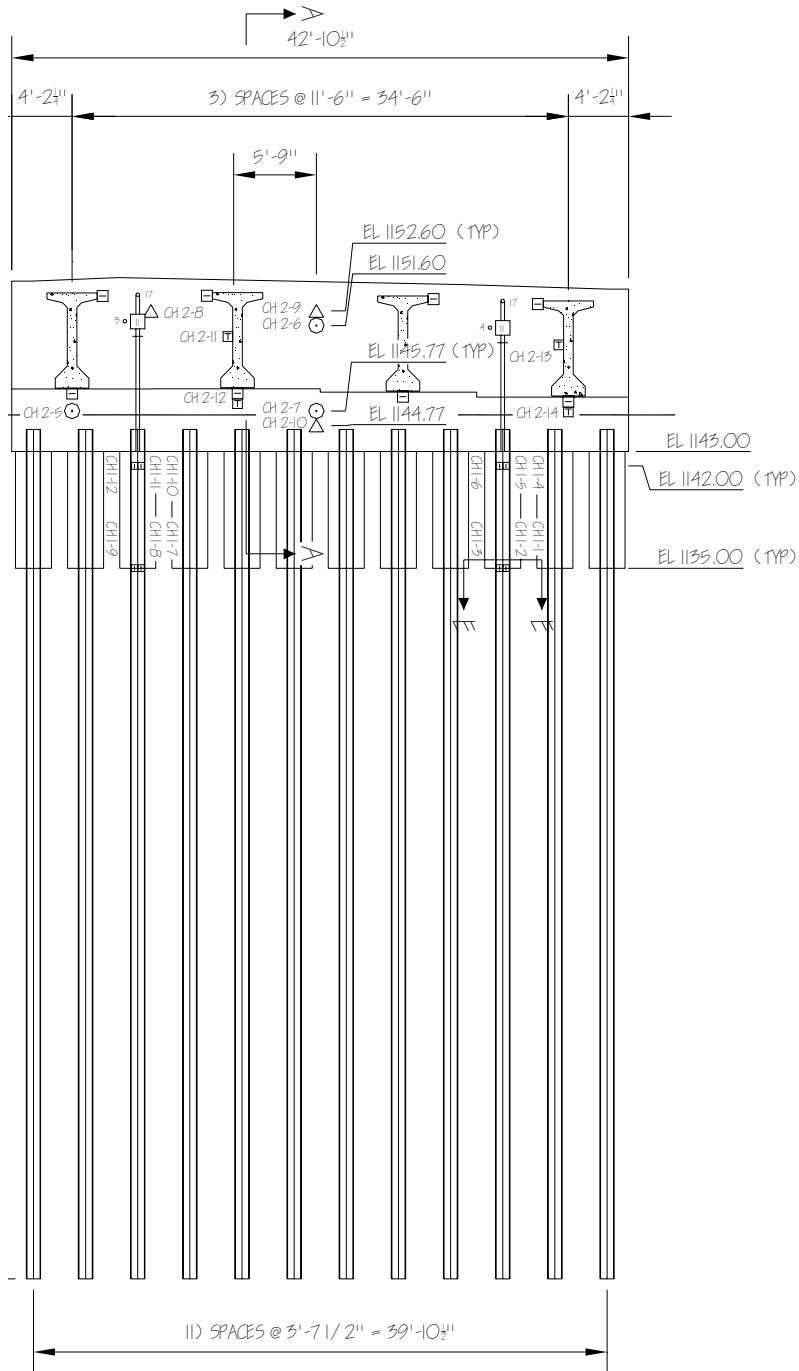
Bridge 109 cross-section through north abutment (section A-A)
